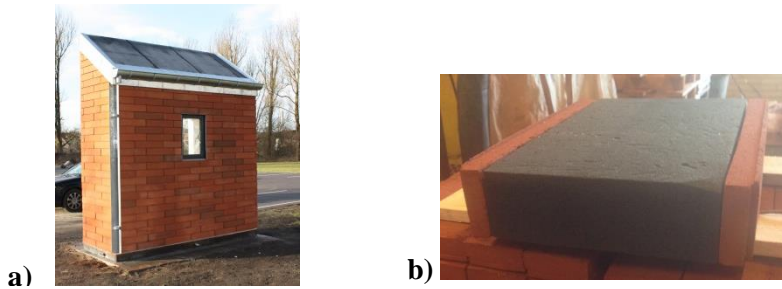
a) Mock-up of a wall section consisting of b) foam glass sandwiched between two red clay bricks.
